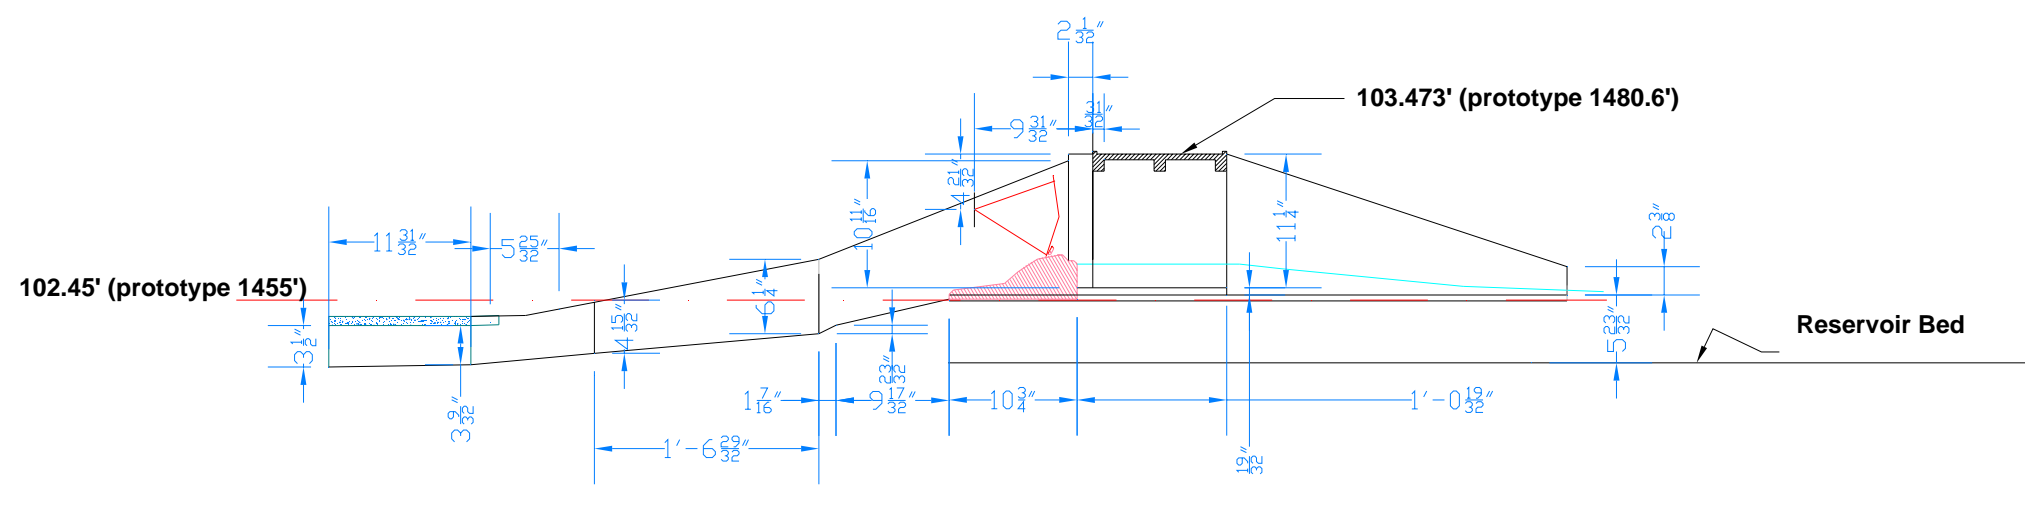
The cross-sections of the embankment, which was made of lumber and plywood.
